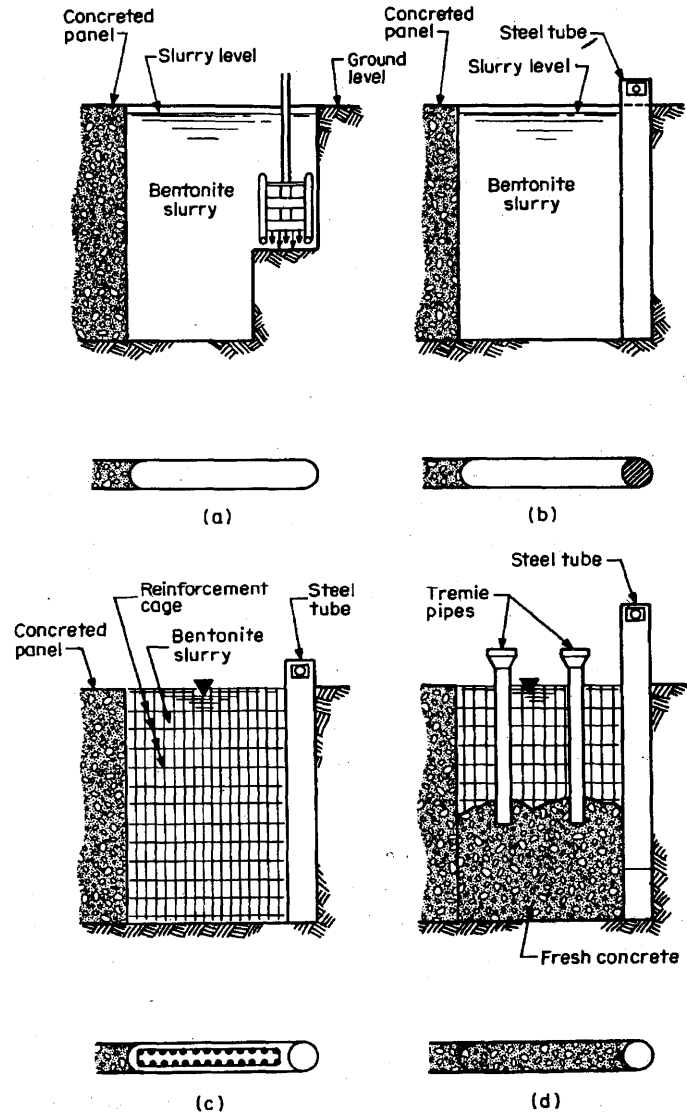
Typical construction sequence of a diaphragm wall, executed in four stages: (a) Excavation. (b) Insertion of steel tubing. (c) Placement of reinforcement cage. (d) Concrete placement. (extracted from Xanthakos (1994)).
